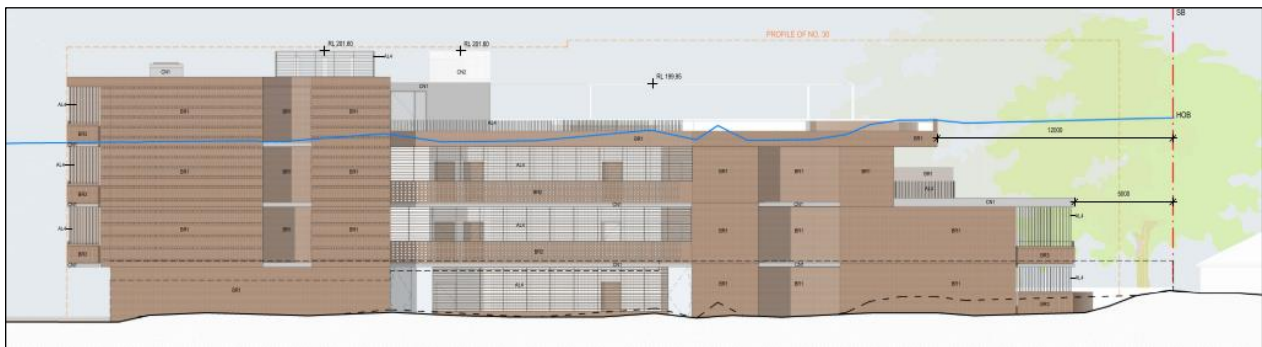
South elevation of proposed development showing HOB and storeys at rear (viewed from adjoining RFB)
